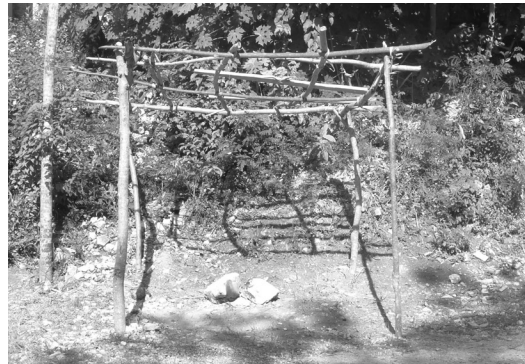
Correlating Site Images to the site plan in Figure 45 (Author)
